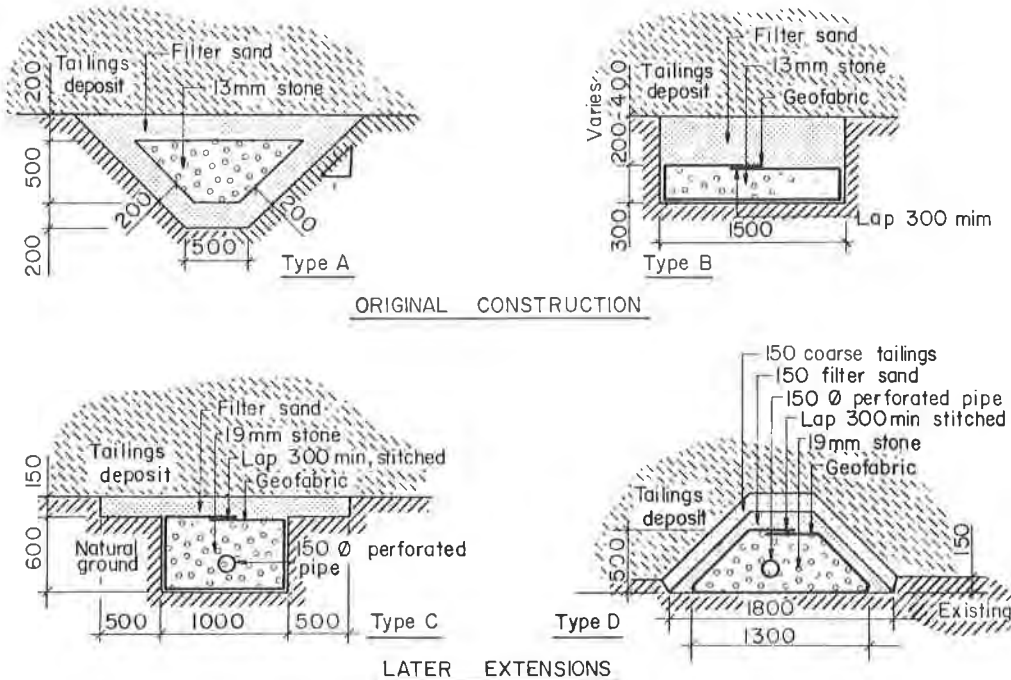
ERGO Tailings dam - Typical filter drain details
